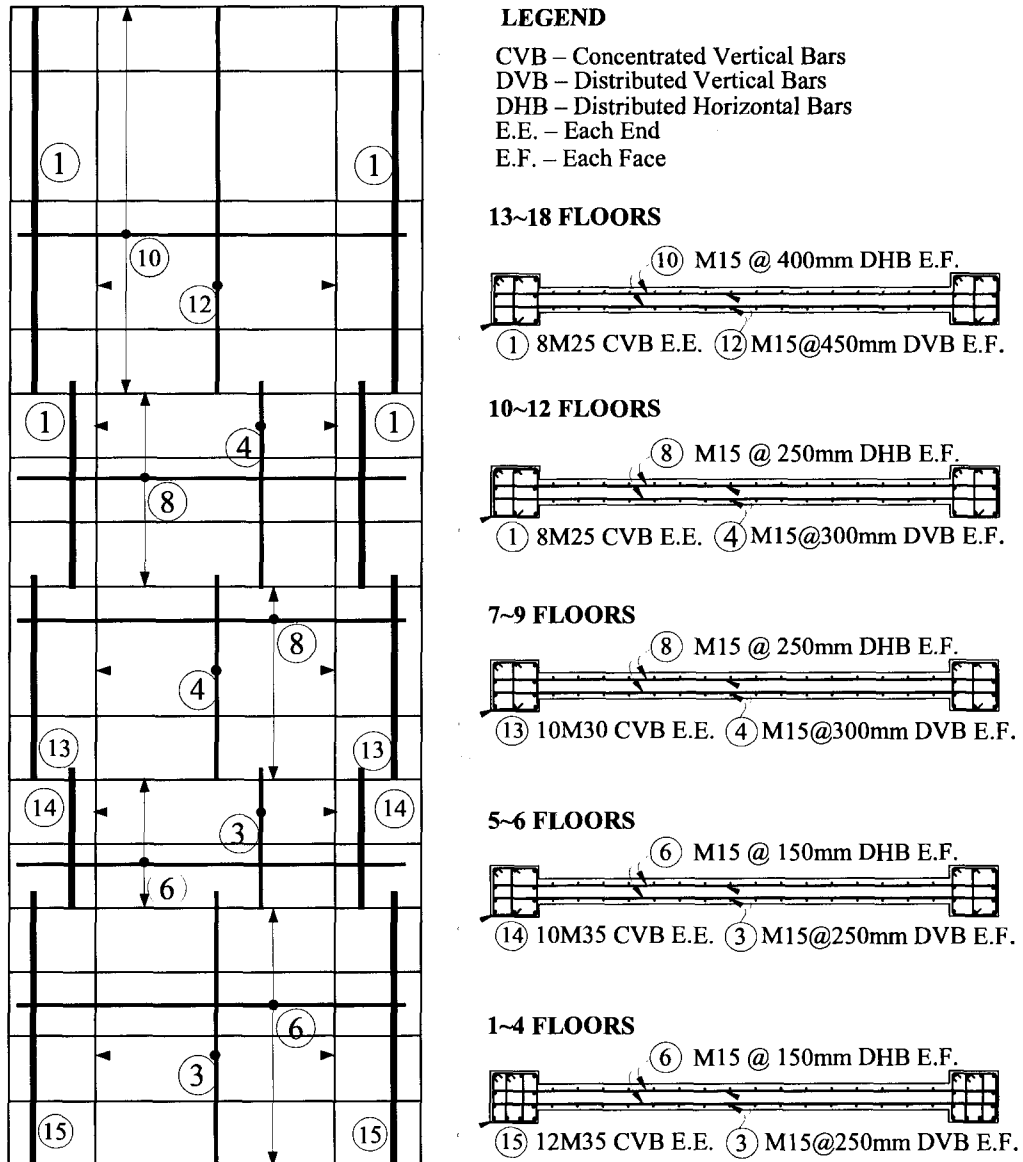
Shear wall reinforcement in B18 building located in Vancouver.
